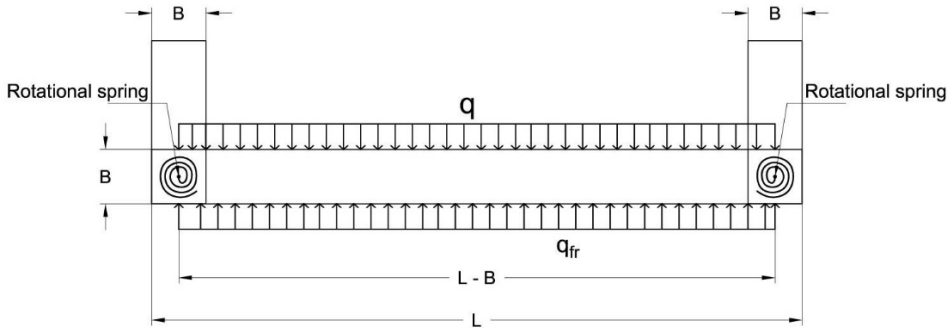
38 - Rigid beam between elastic orthogonal walls
